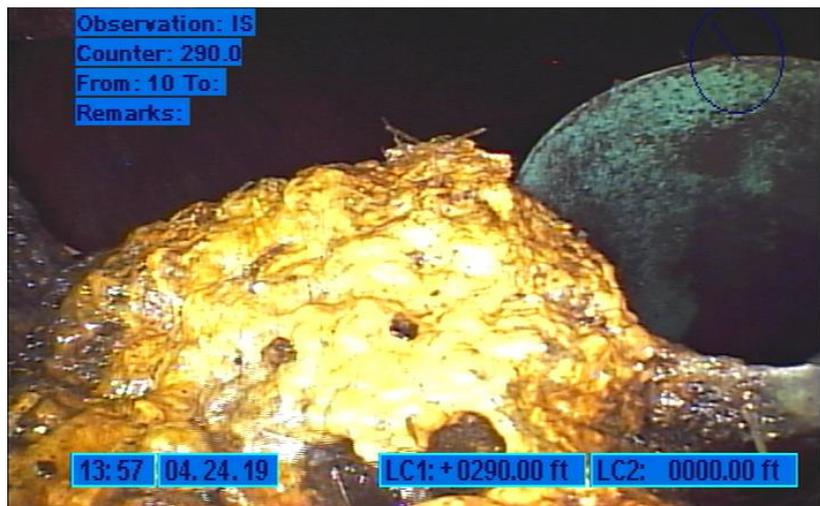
Unknown PVC pipe penetration at northern wall of CO-2
